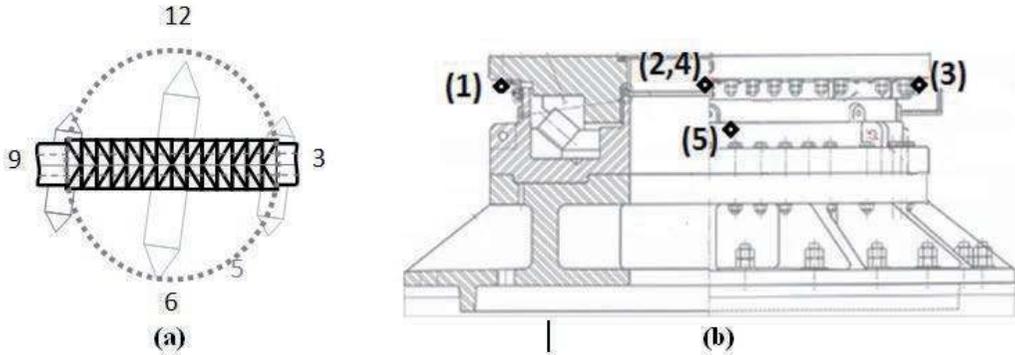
(a) Plan view of swing bridge with clock face representation of bridge angle superimposed; (b) Elevation view of sketch of AE transducer layout on pivot
